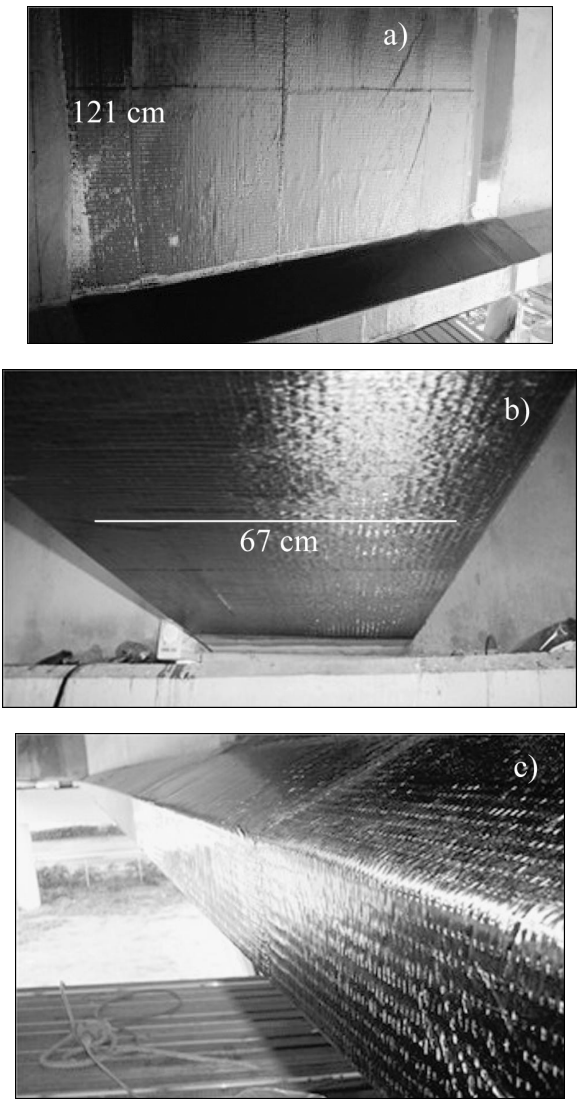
(a) Part after debagging; (b) bottom flange detail and (c) bottom flange side detail.
